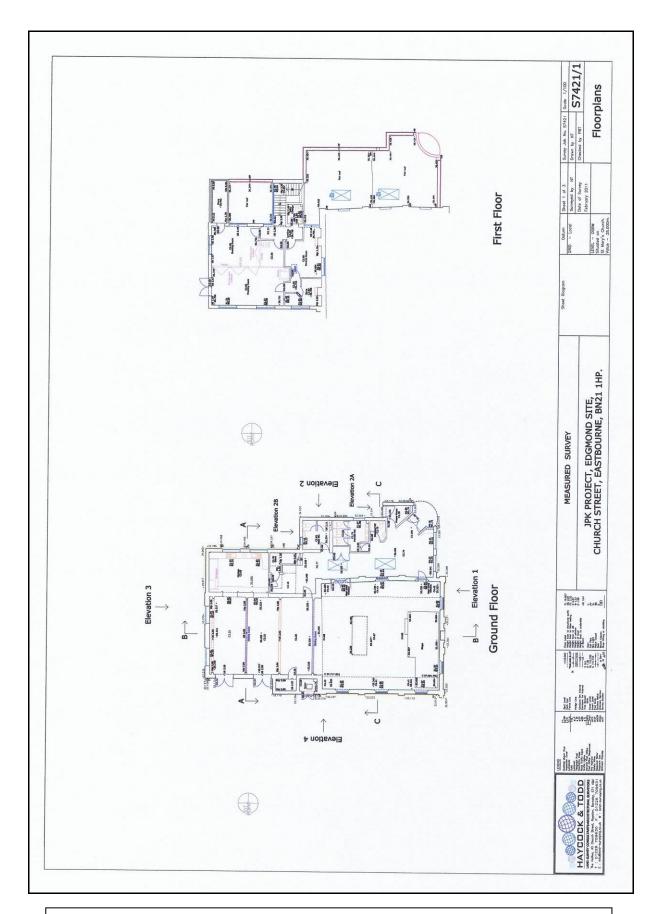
Edgmond Chapel, Eastbourne: Plan of Current Building (adapted from architects drawing)
